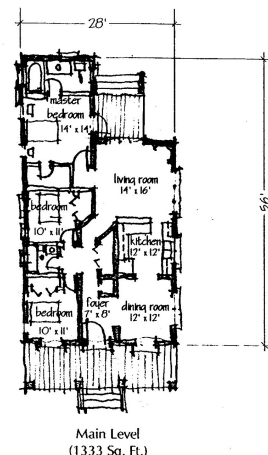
Silver Series: The Shotgun House (Hall and Hull Architects)
